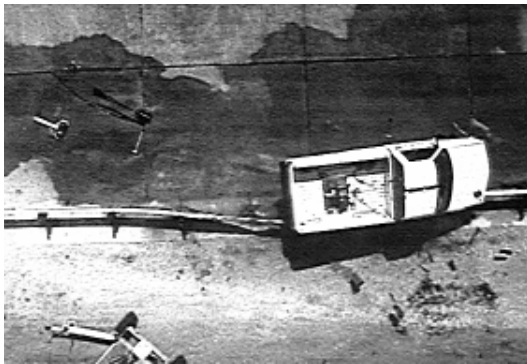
Sequential Photographs for Test 441622-1 (Overhead and Frontal Views).
